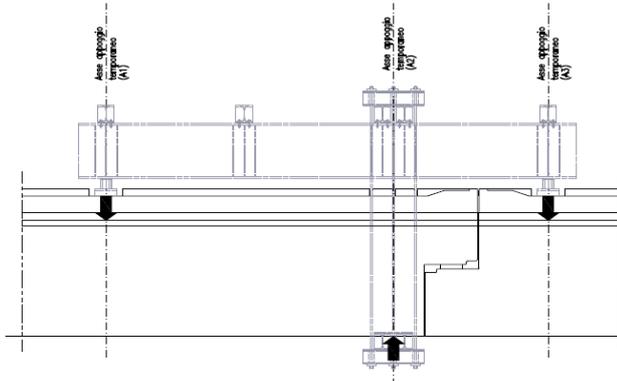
Steel framework for the lifting of the deck/struttura in acciaio per il sollevamento dell'impalcato.
